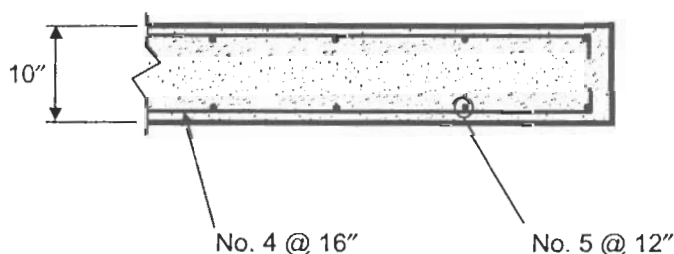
Reinforcement Details for Shear Wall No. 5 (SDC C)
